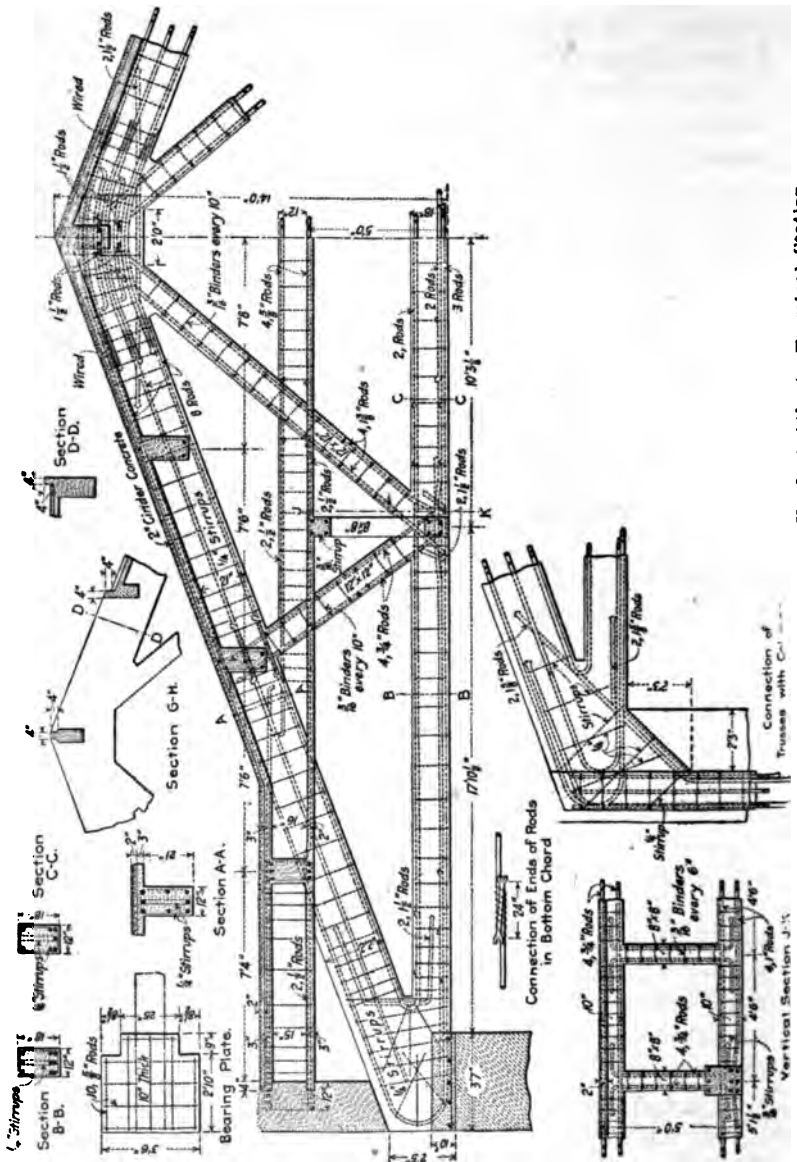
Roof Truss of 50-ft. Span Used at Atlanta Terminal Station.
